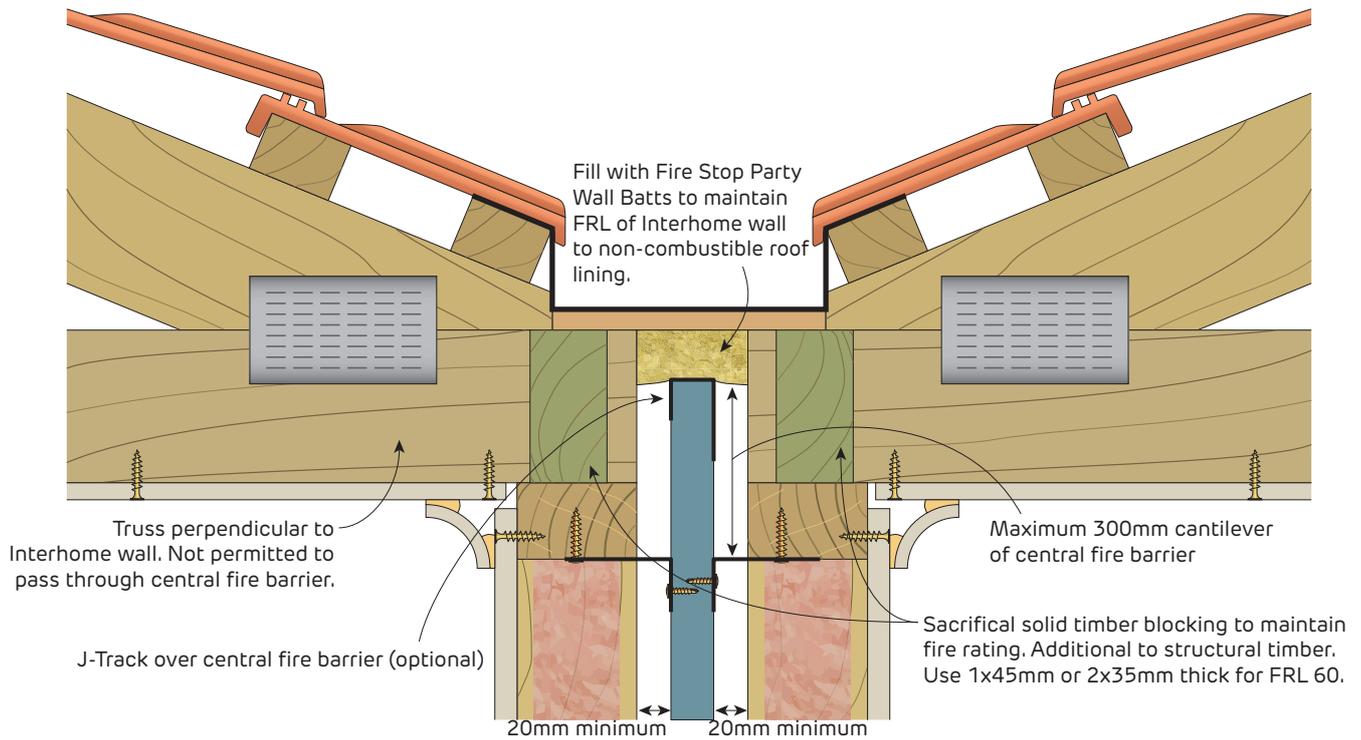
Interhome Wall to Box Gutter with Perpendicular Roof Trusses
